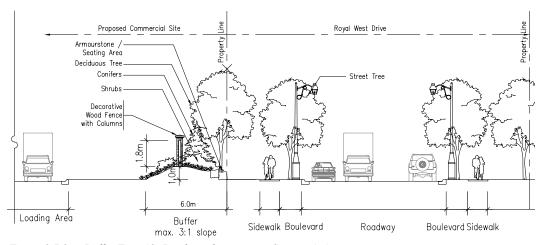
Buffer Type A2: Loading along street - Section A-A
